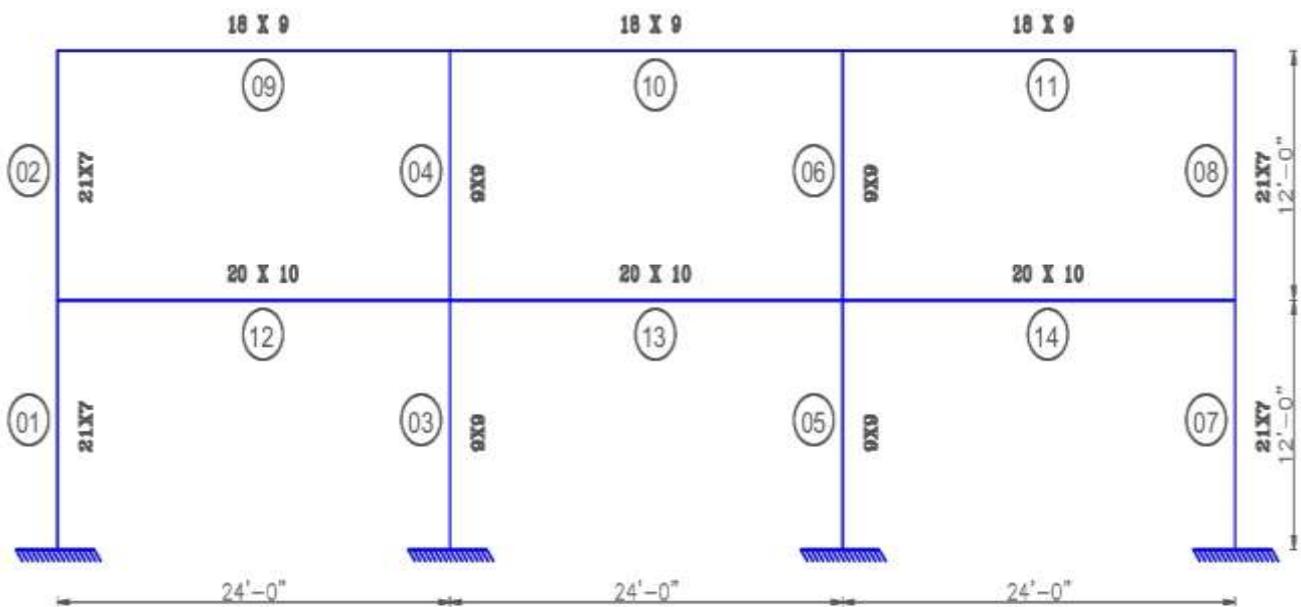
Final optimized member sections for beams and columns of 3-bay 2-storey concrete frame structure
